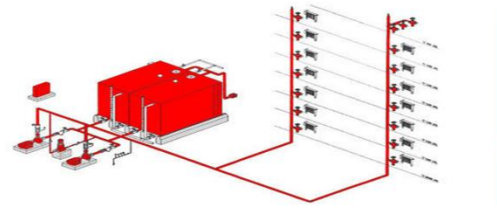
APARTEMENT BUILDINGS EXCEEDING 16M
